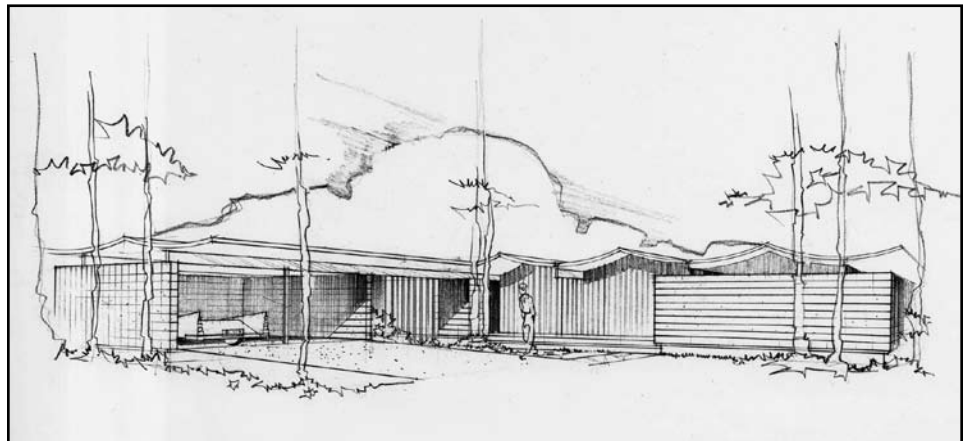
Brill House [Charles Reed, Jr. collection, c. 1959]
